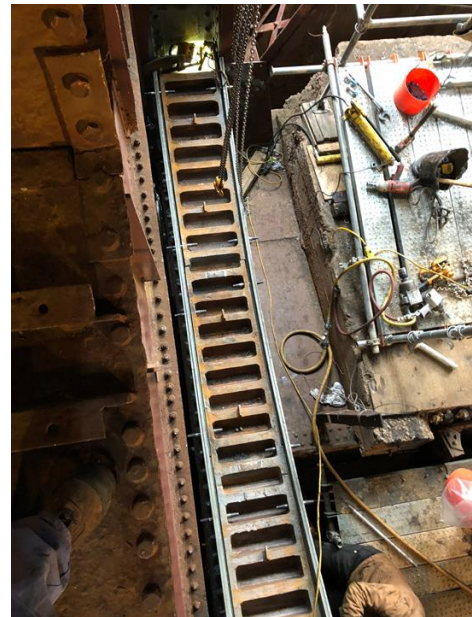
Rack segments installed with alignment pins, ready for final drilling and reaming.
